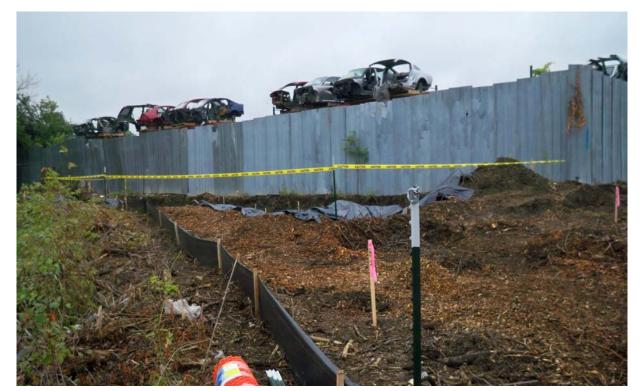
Installed silt fence and caution tape for access control within excavation footprint
